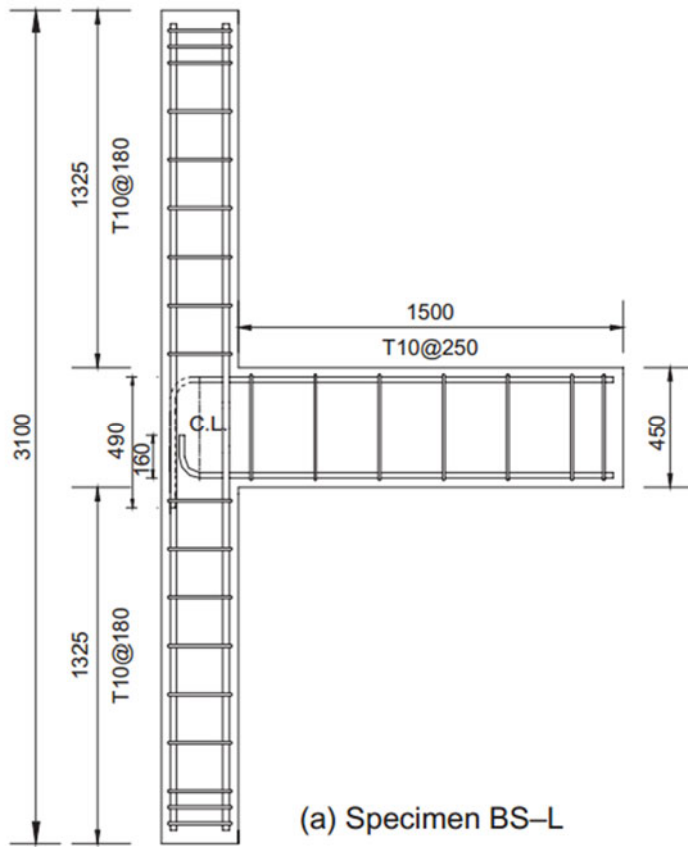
Test units BS-L: dimensions and reinforcement details (Kuang and Wong, 2005)
